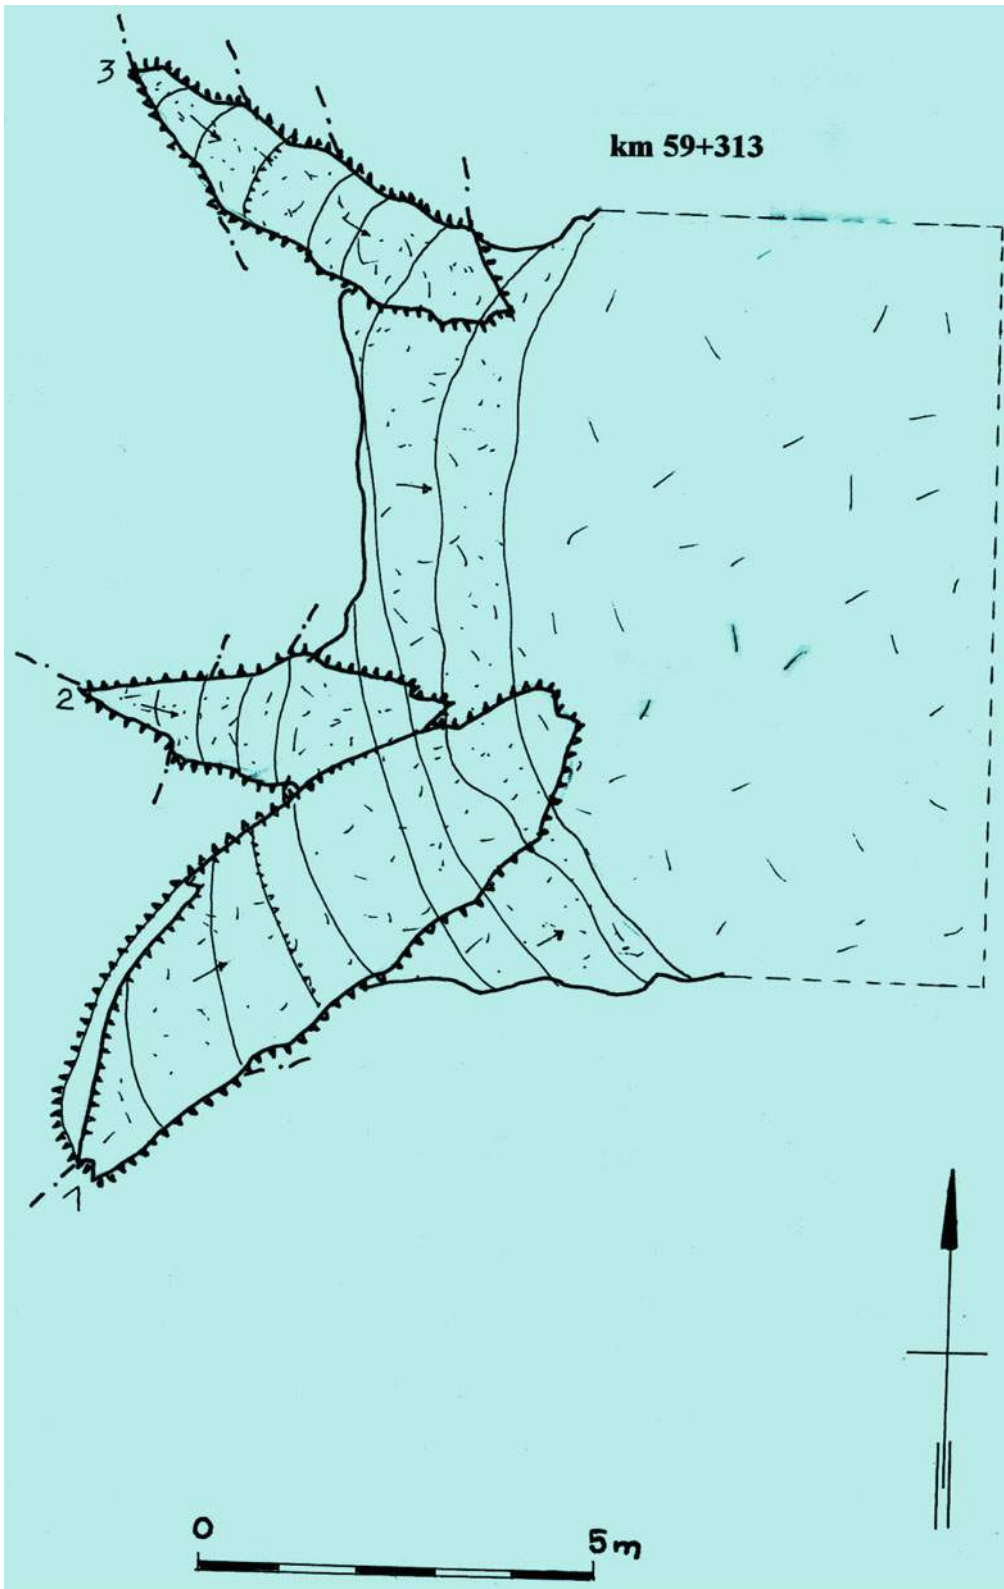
Plan of cavern at km 59 + 313 in Čardak Tunnel
